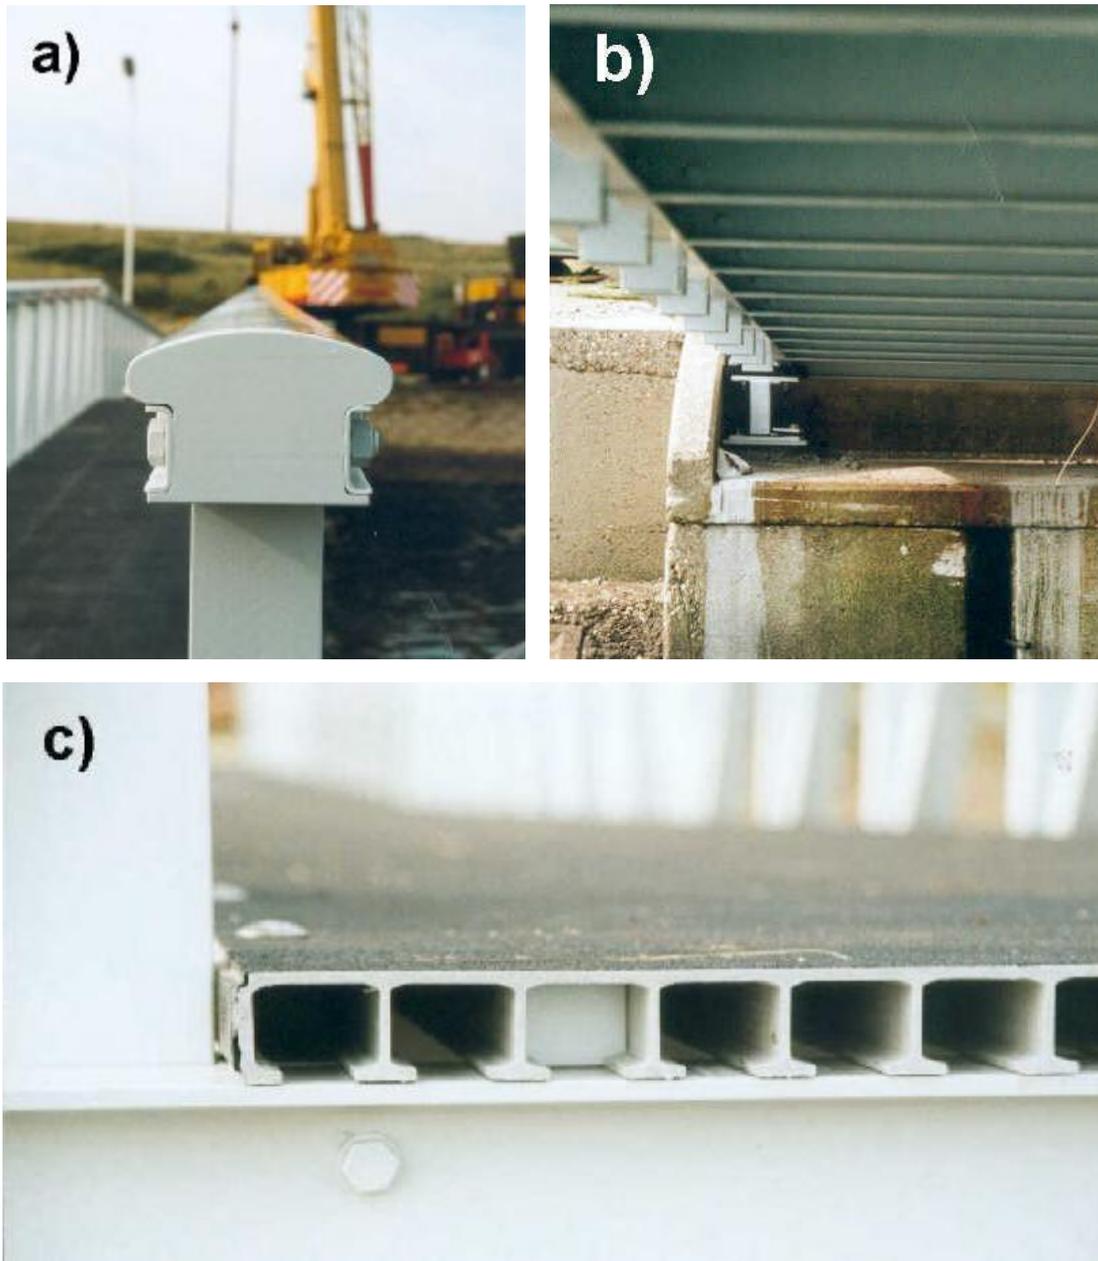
Noordland pedestrian bridge, details: a) upper chord / handrail; b) deck cross girders; c) deck plank.
